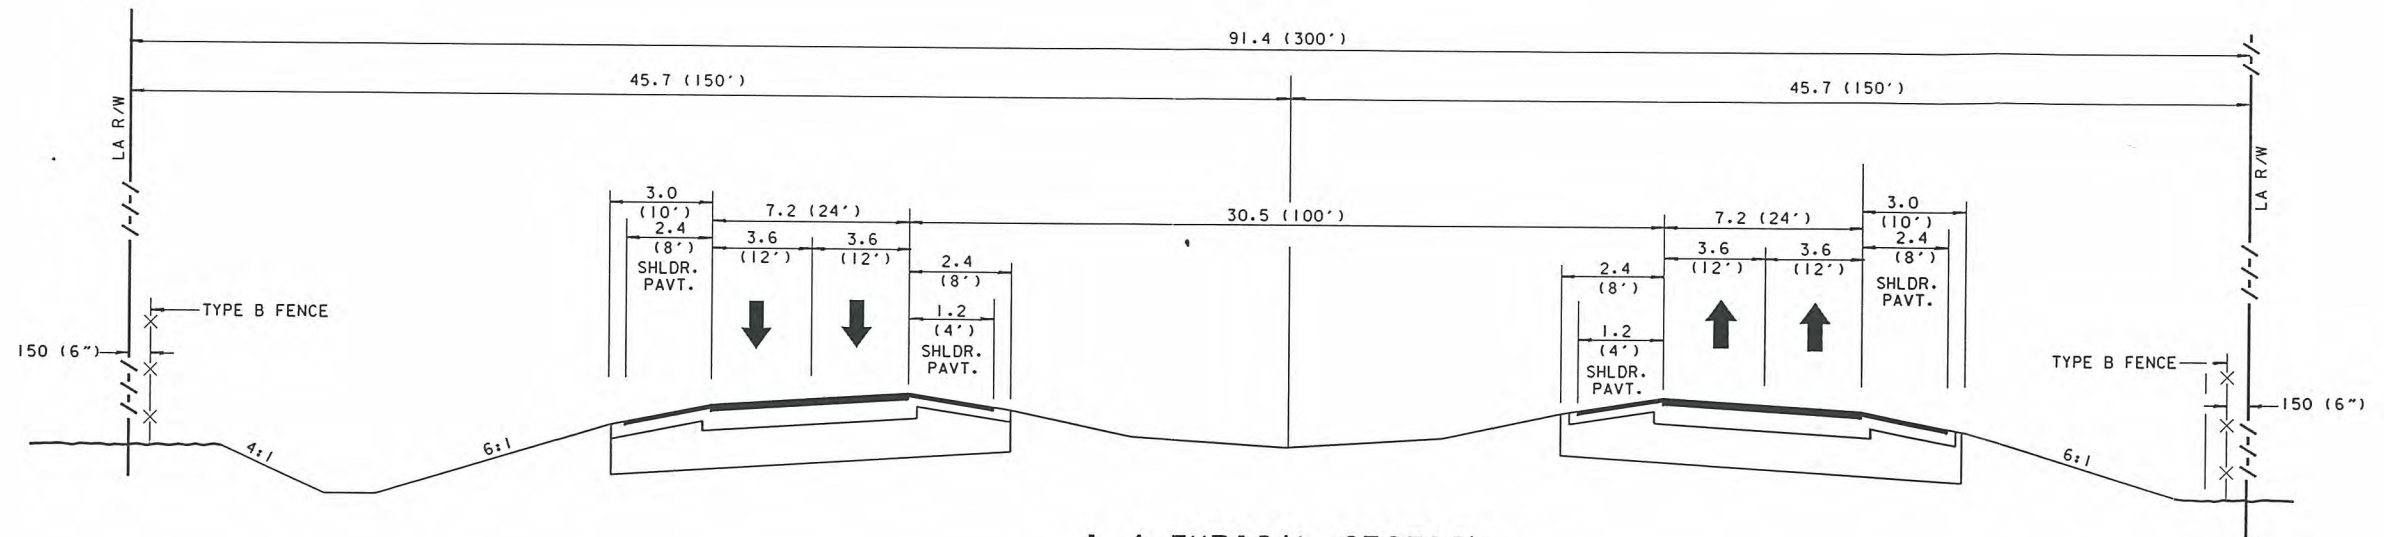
, Typical Sections 1 and 2, show only four lanes for the section of this project from C.R. 532 to southwest of the World Drive interchange. The future widening to six lanes will generally be done to the inside where the median is 30.5 (100 ft.) wide and to the outside where the median is 19.5 m (64 ft.) wide. Typical Section 3 shows the I-4/World Drive CD roads; Typical Section 4 shows the auxiliary lanes adjacent to the World Drive interchange. Typical Sections 5, 6, and 7 cover the existing six-lane portions of I-4 within Section 1. Typical Section 5 covers the six-lane sections without auxiliary lanes, Typical Section 6 covers the westbound CD system at the S.R. 536 interchange, and Typical Section 7 shows the six-lane segments of I-4 with auxiliary lanes.
